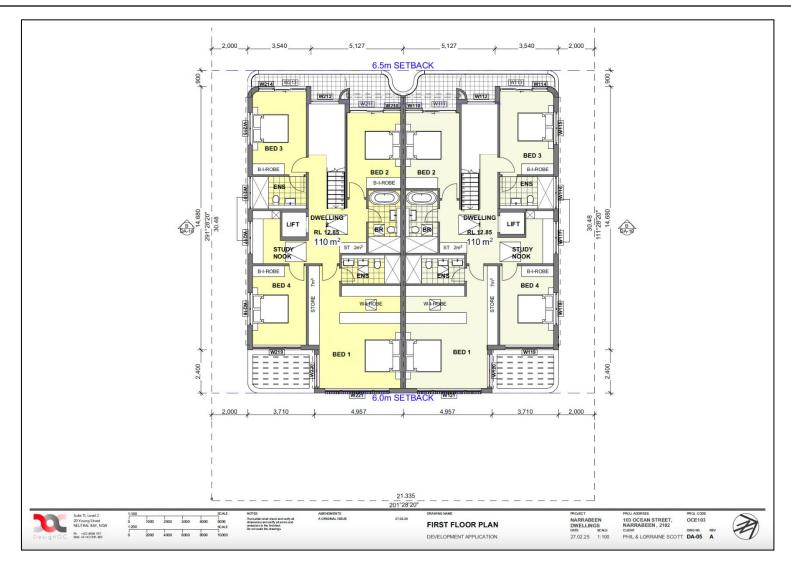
PROPOSED FIRST FLOOR PLAN
